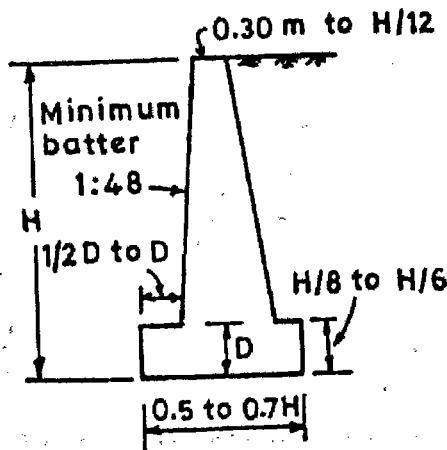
Tentative dimensions for a gravity retaining wall
